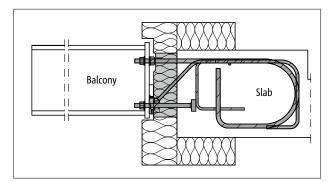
Schöck Isokorb® T type SK-M1: Special design based on the lateral force load ranges M1
